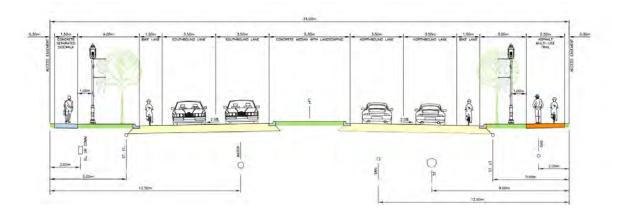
Proposed Cross-Section for Centre Avenue (Arterial) Expansion
